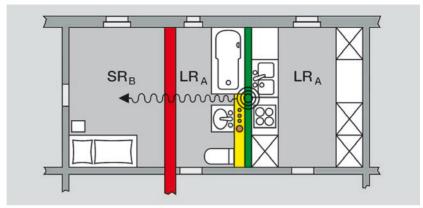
166 Layout that is favourable with regard to building acoustics
